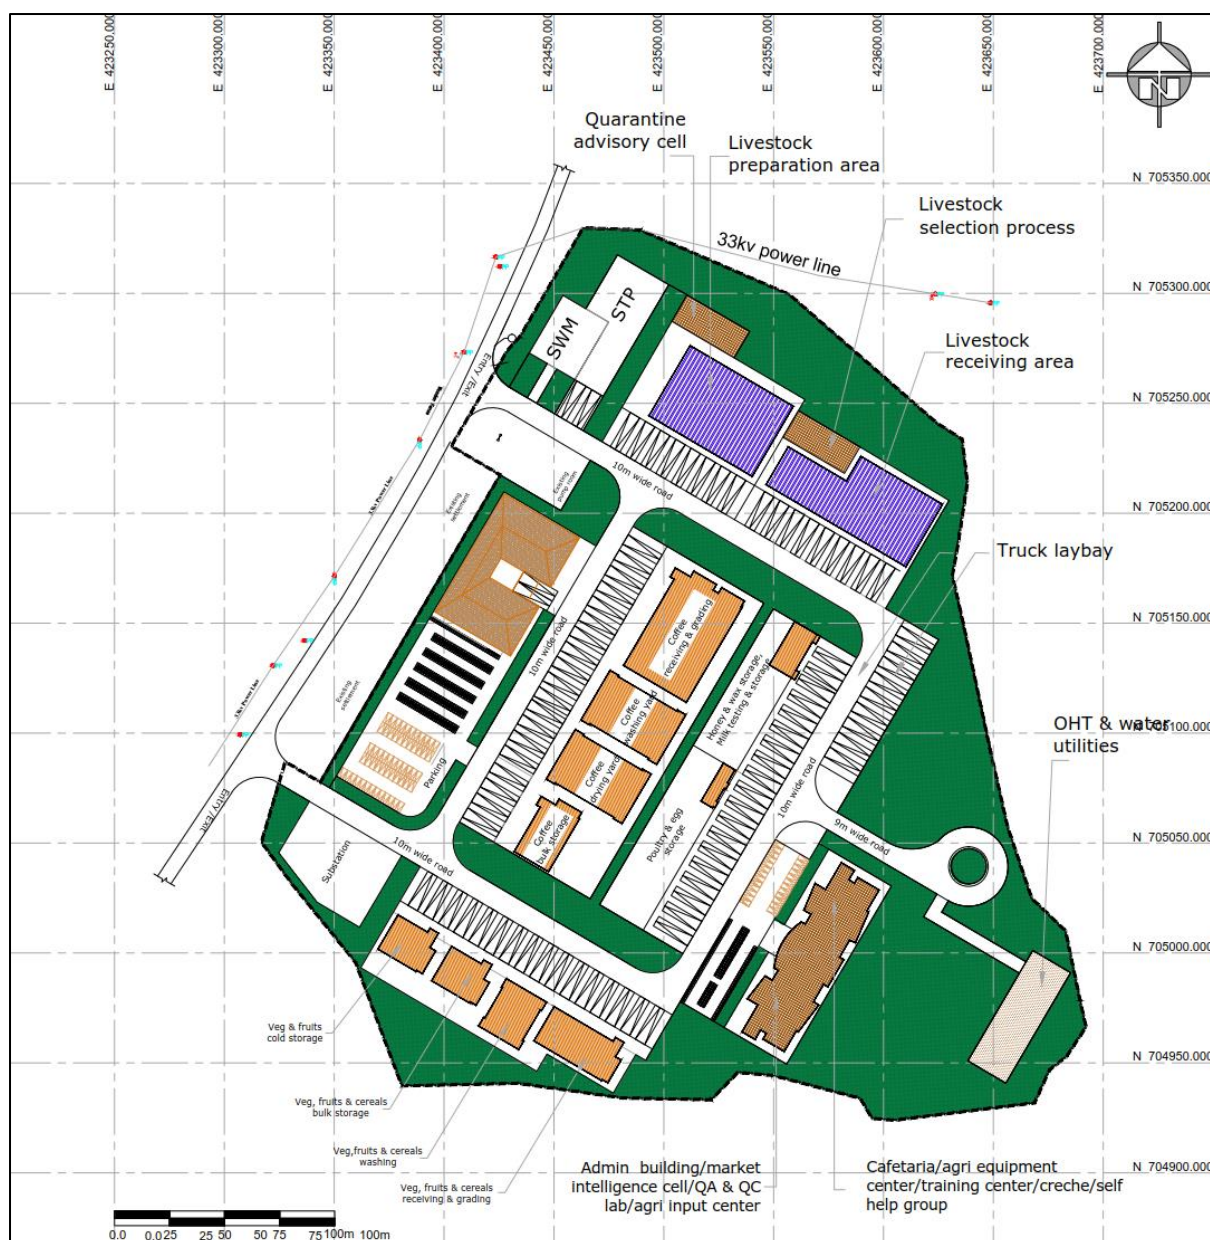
Master Plan of the Dilla RTC (Source: MACE master plan drawing)
